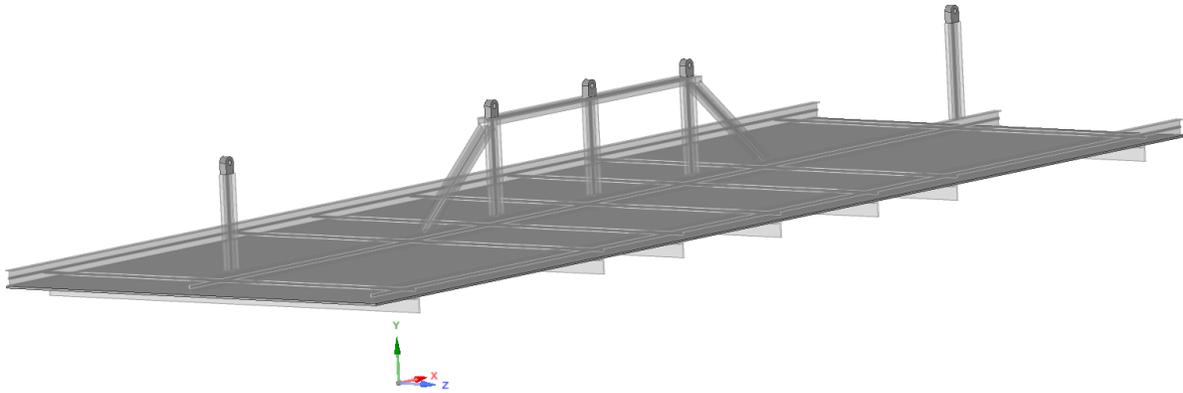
Steel plate, frame and padeyes embedded in concrete gravity anchor
